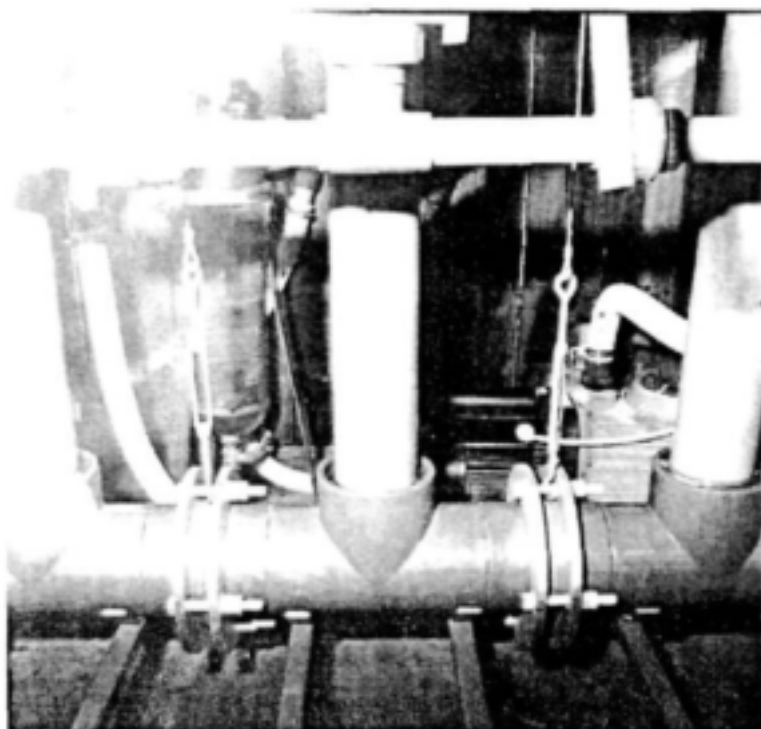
Flanged 110 mm T-pieces into which 90mm bayonet modules fits.
